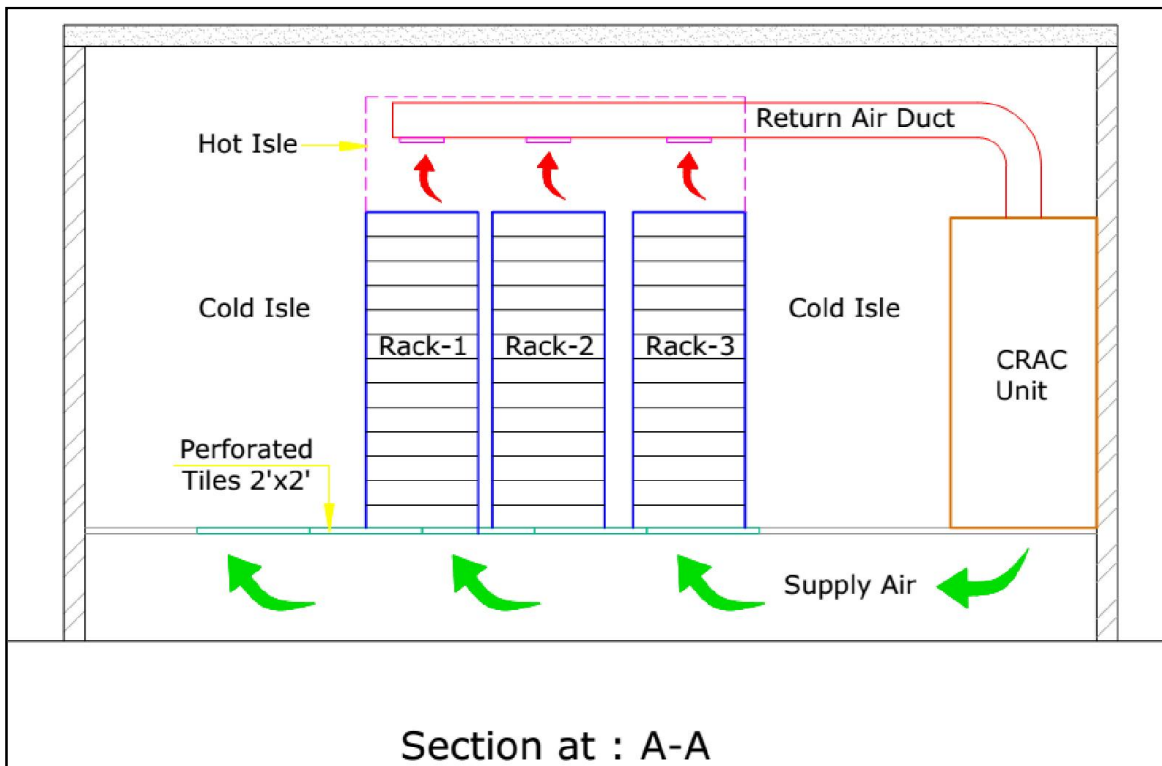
RCMS Data Centre Proposed HVAC Layout Plan Section at A-A
